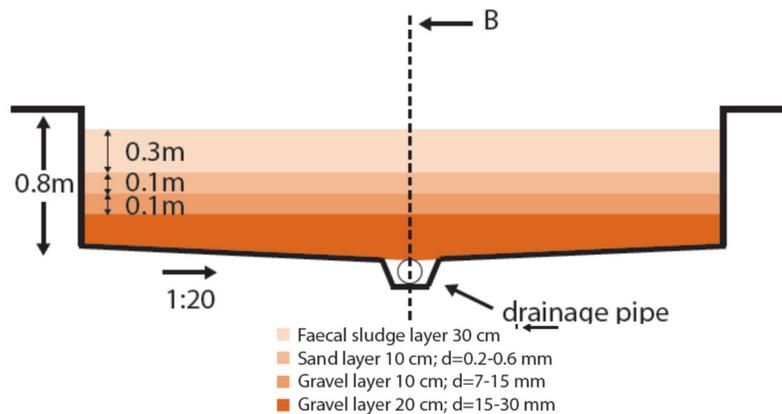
Typical Cross Section of an Unplanted Sludge Drying Bed
